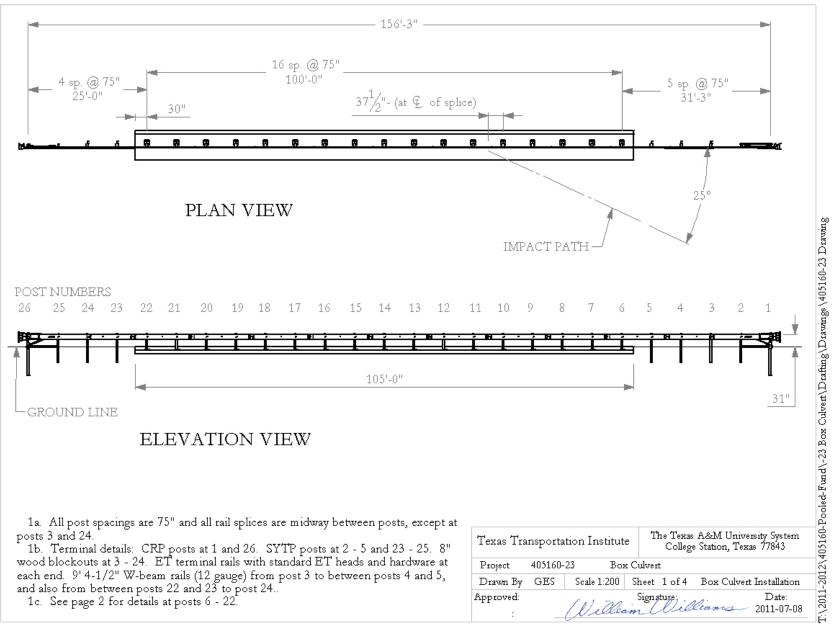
Layout of the W-Beam Guardrail on Low-Fill Box Culvert.
